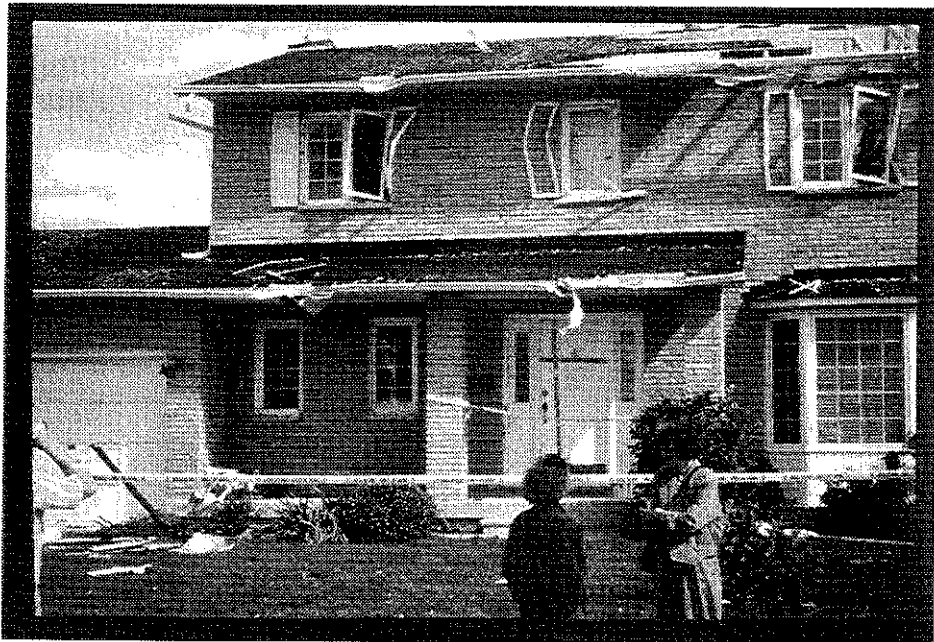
Roofing and sheathing failure of southern third, (both slopes) of gable roof, plus missile damage.
